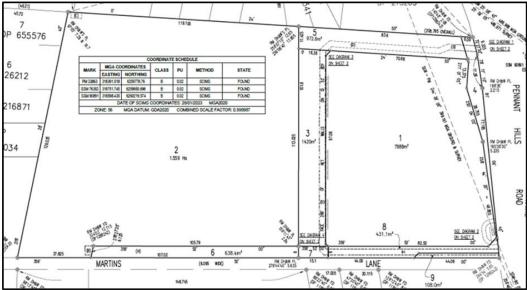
Proposed Plan of Subdivision approved by SC/54/2023
